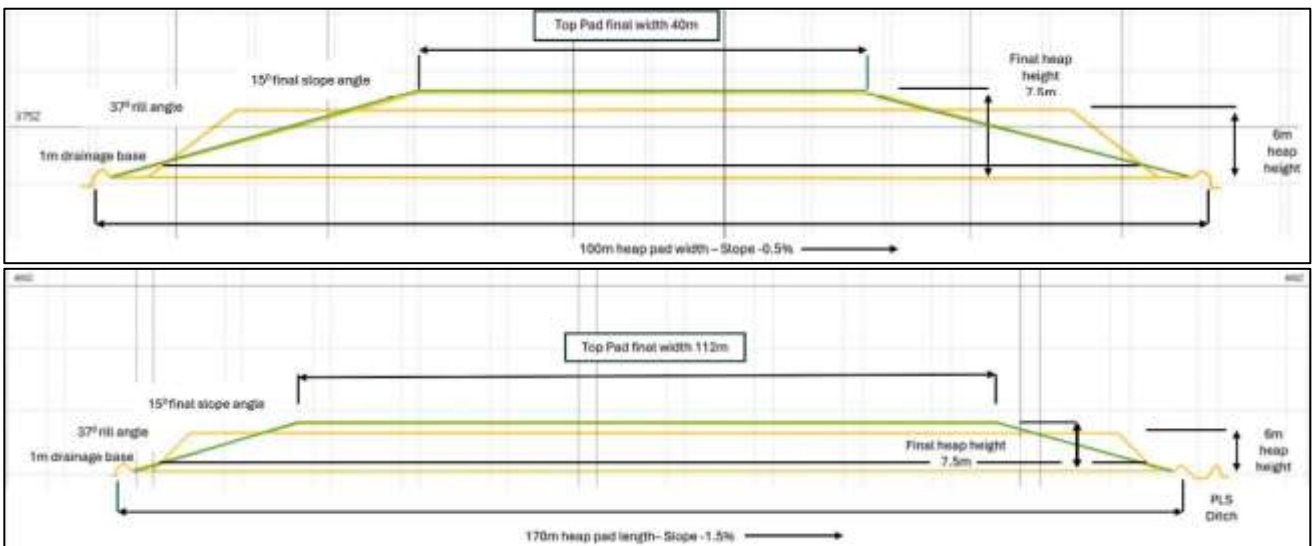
Heap Leach Pad short cross section (top) and long cross section (bottom), (Sourced Astill 2026)
